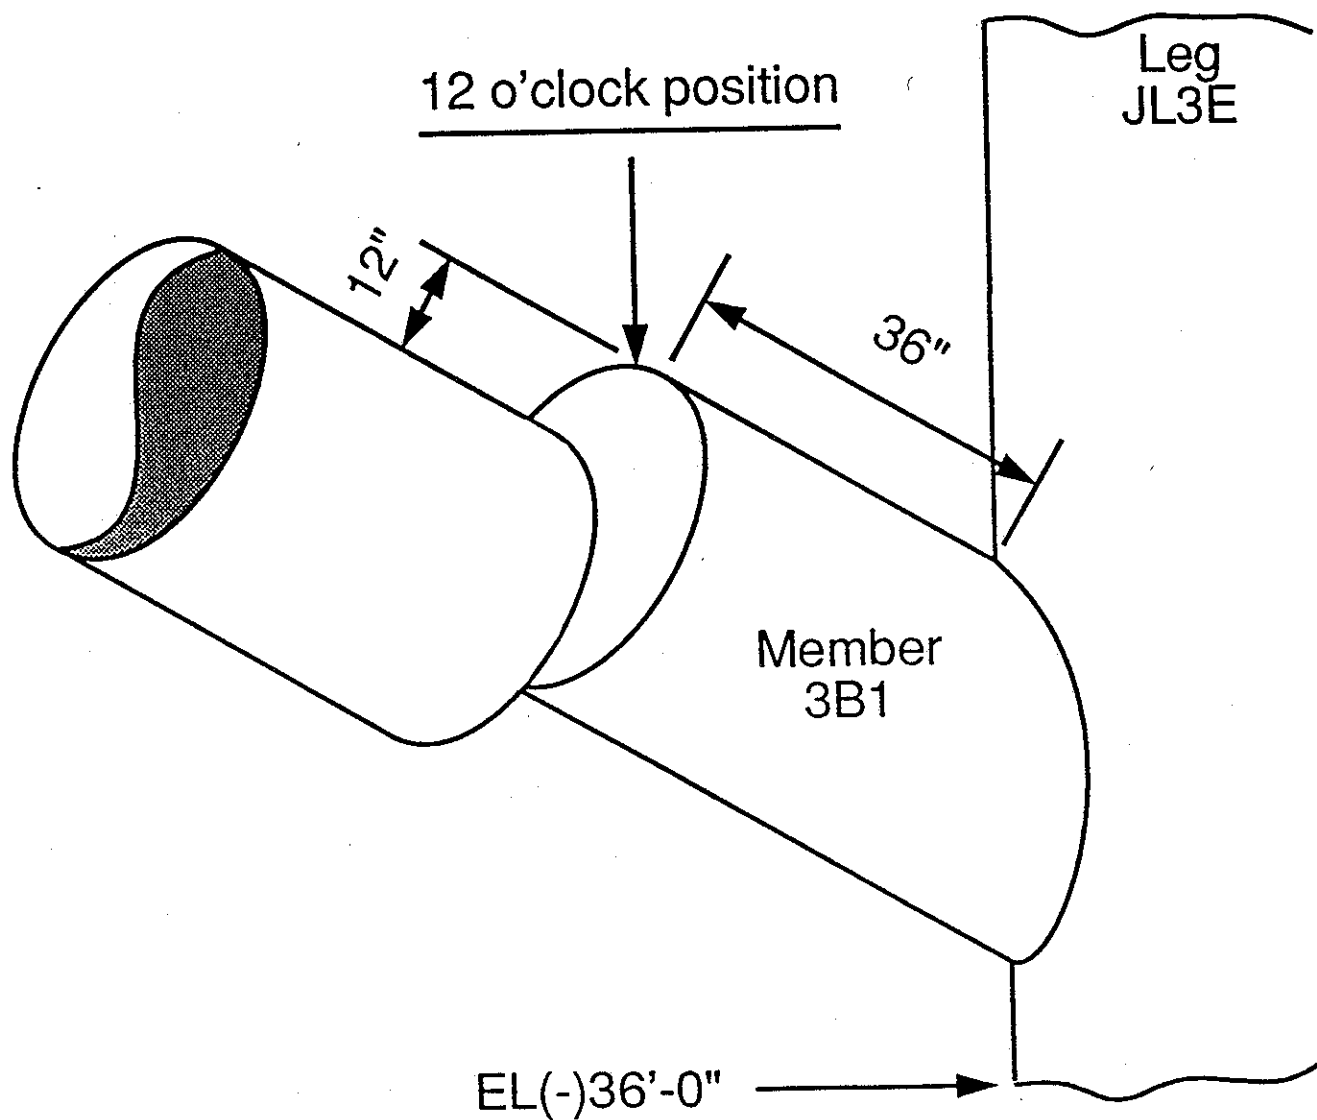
The brace separated from the stub at a circumferential weld.
